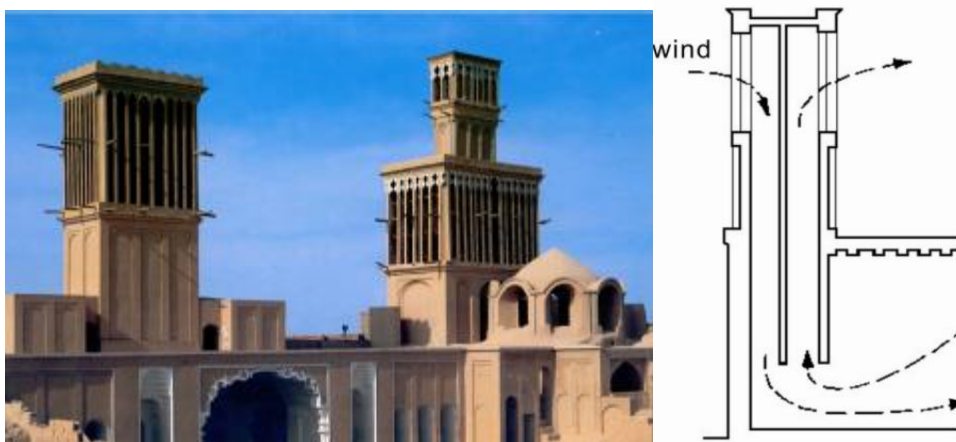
The two story wind tower building in Yazd, Iran (left); Section of wind tower (right), [3].
